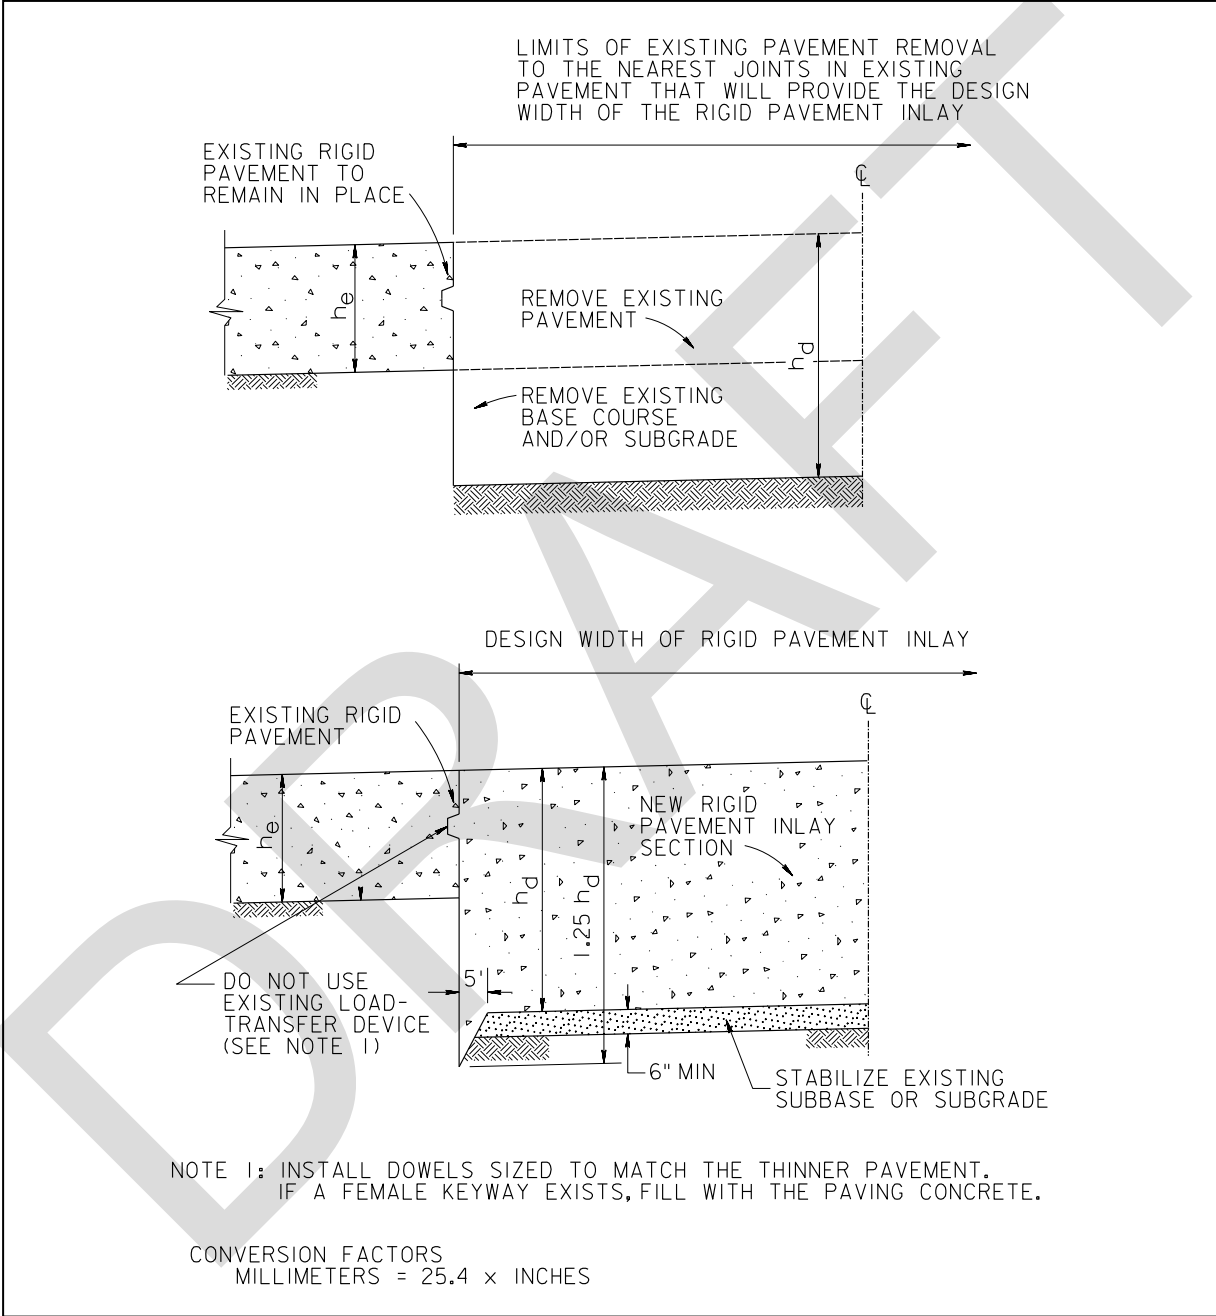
shows a section of a typical rigid pavement inlay in an existing rigid pavement. Paragraphs 18-3.1 through 18-3.3 detail the requirements for rigid inlays in existing rigid pavement.
